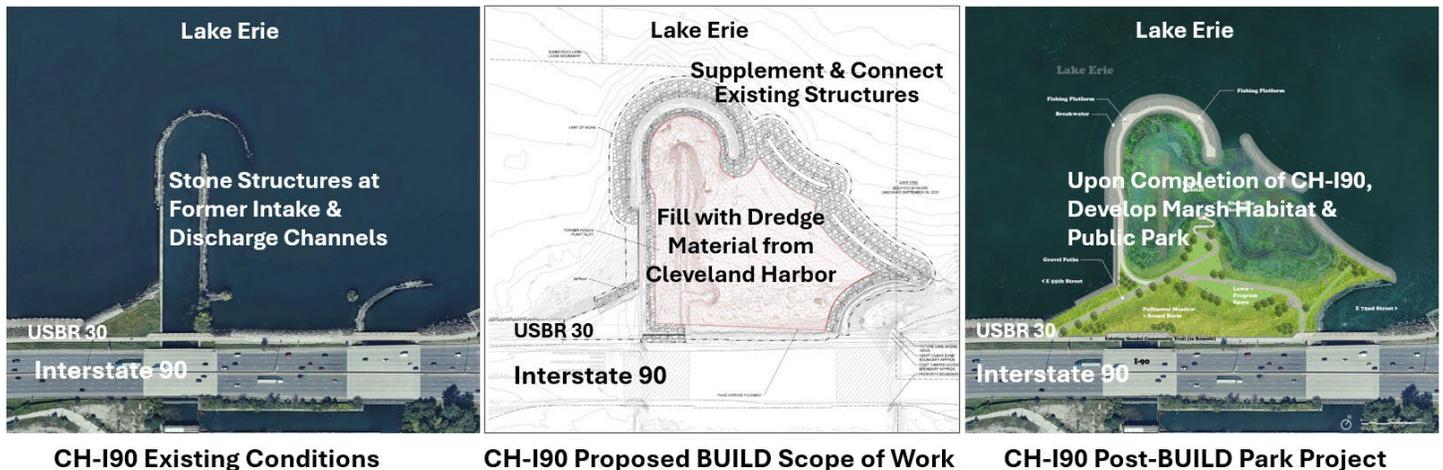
CH-I90 Existing Site Conditions, Proposed BUILD Project Scope, and Post-BUILD Park Project
